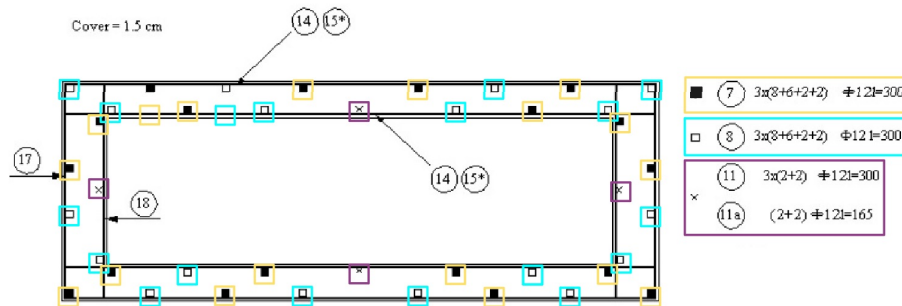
Longitudinal bars in cross-section 2 of pier A40 according to PINTO ET AL (2002)
